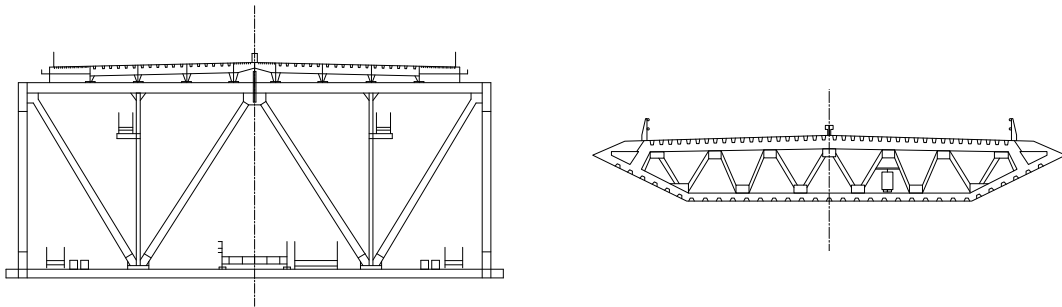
Deck section of Akashi Kaikyo Bridge (left) and Great Belt East Bridge (right)
